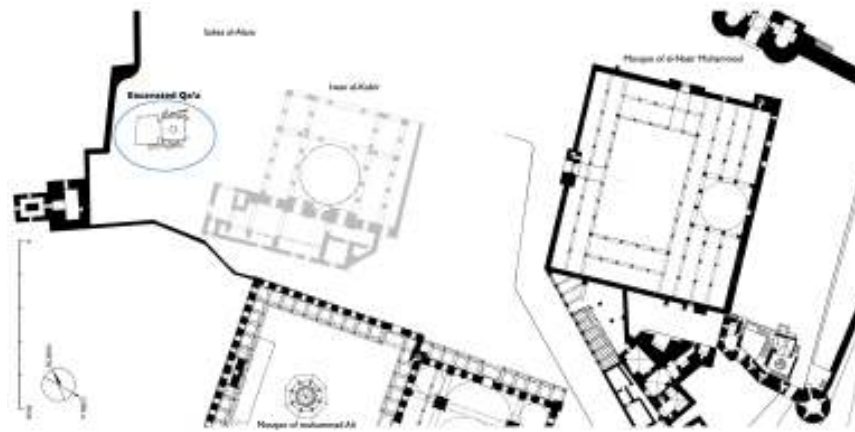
Site plan showing the location of the hall and its relation to the surrounding buildings.
